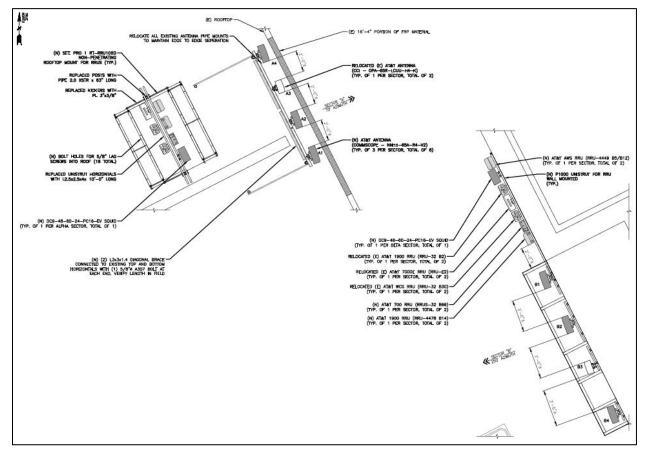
Proposed antennas and RRUs (Source: Plans Page A-4A).
